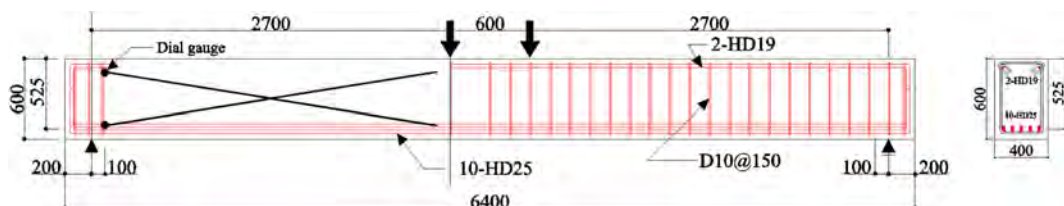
Configuration and dimension of full scale reinforced concrete beam (unit: mm)
